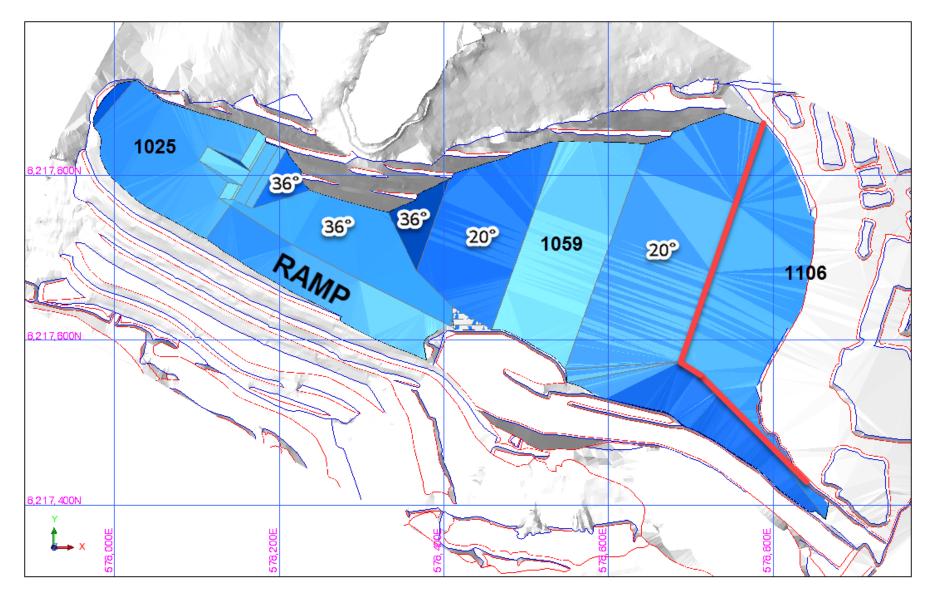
Revised (MP Amendment to be Submitted) Mullet Pit Backfill Landform Concept Design
